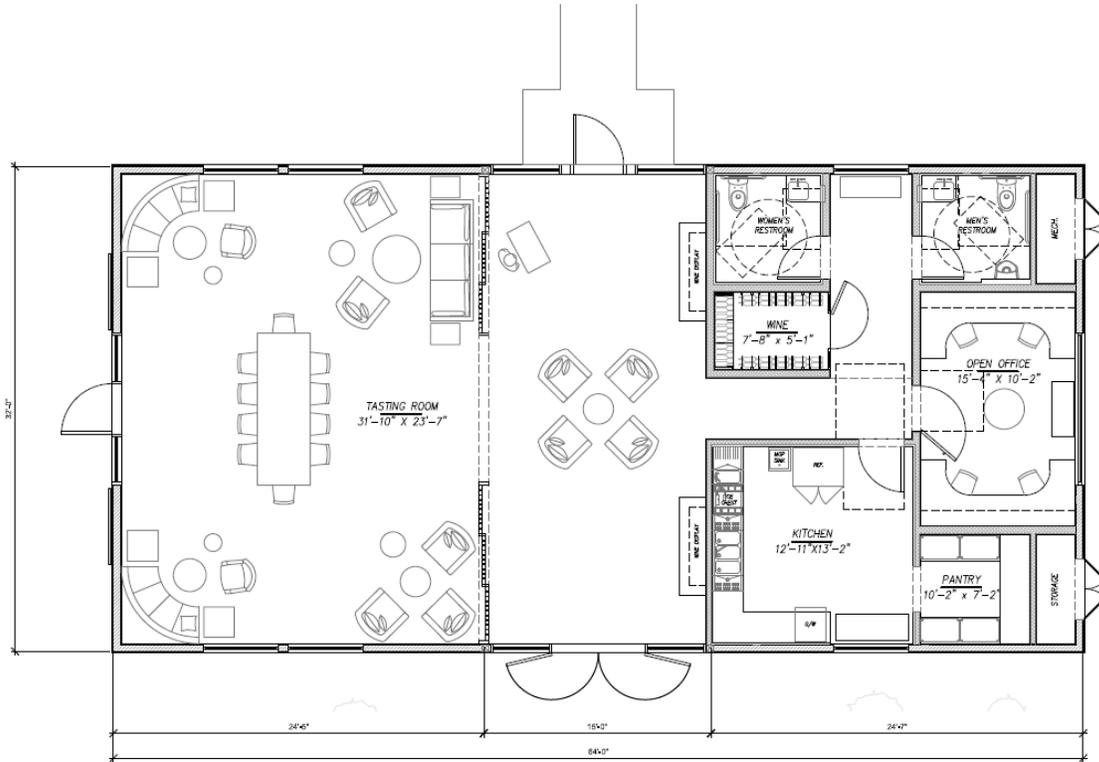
Proposed Tasting Room Floor Plan for the Barn Conversion
